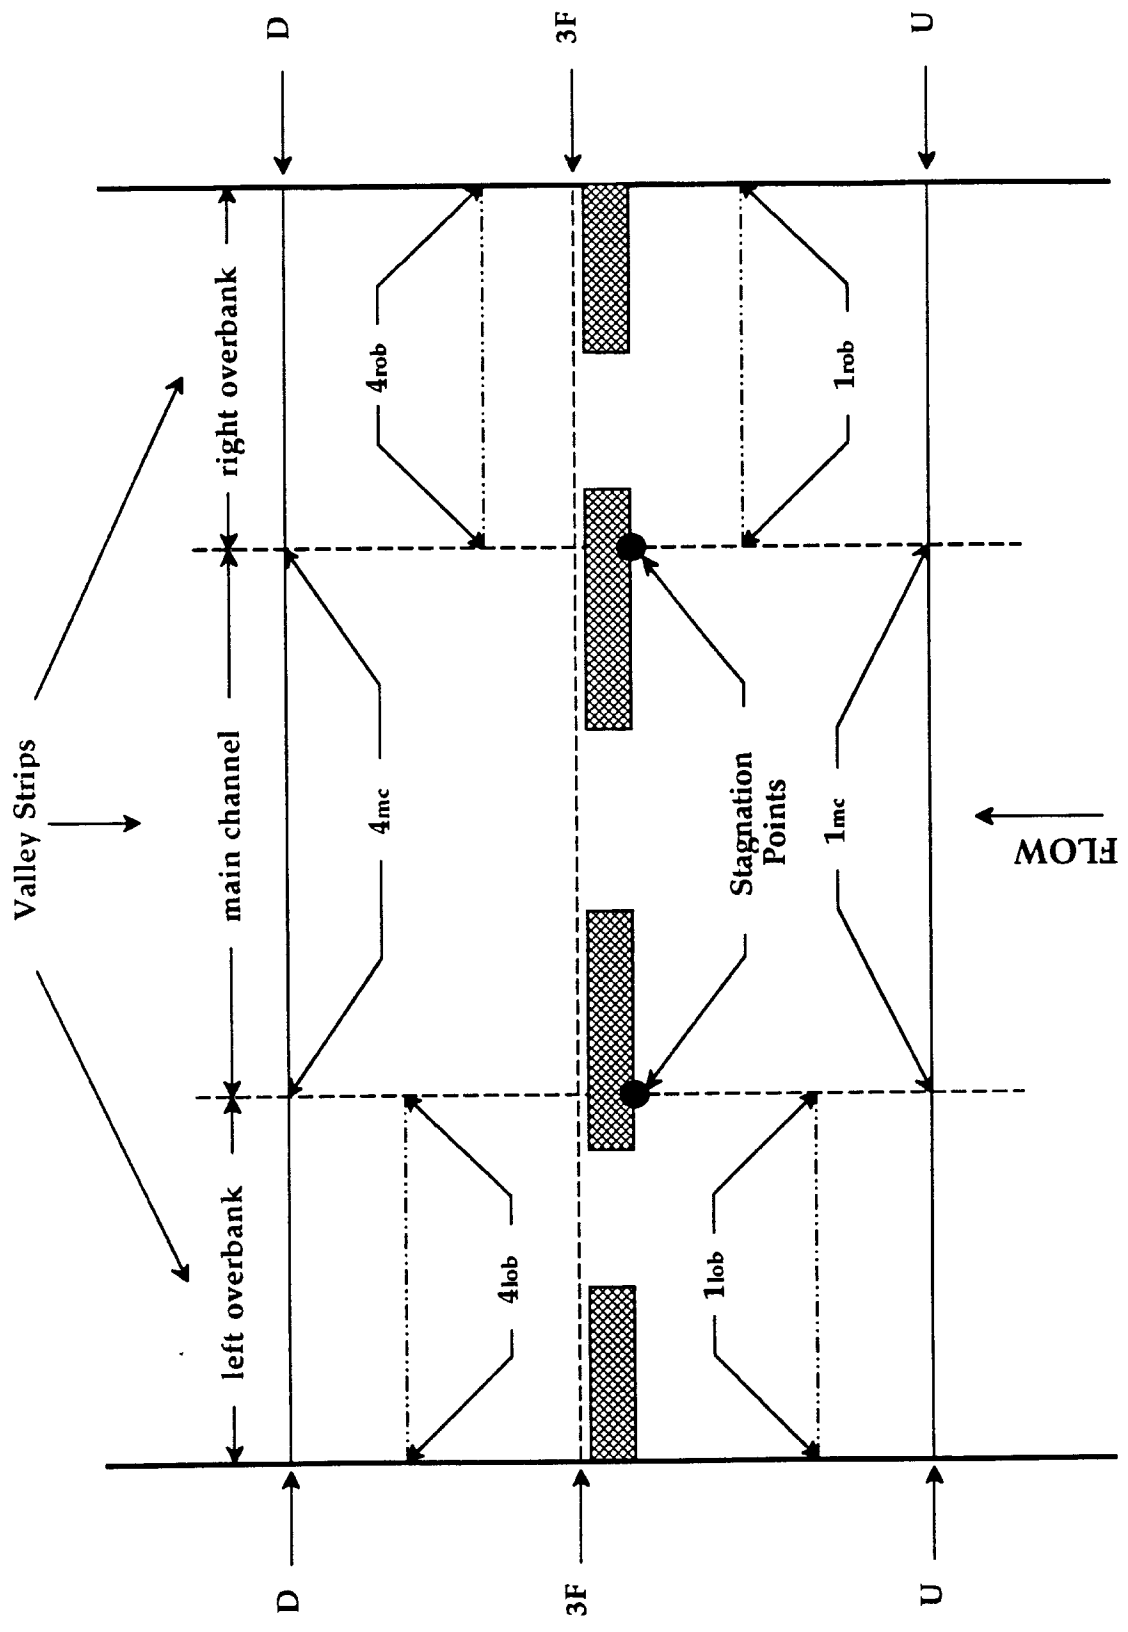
Multiple bridge opening showing valley strips and cross-section locations.⁽²⁾
